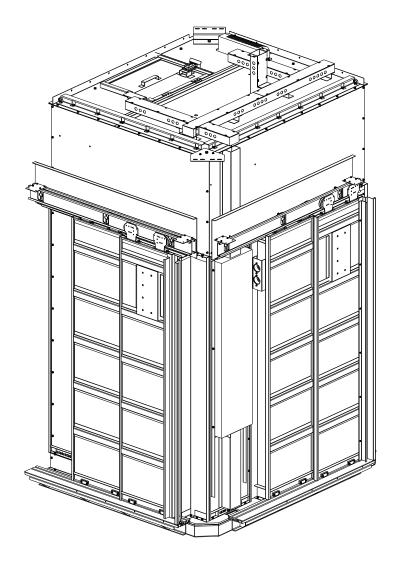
INSTALLATION OF CAR DOOR (CORNER POST)
